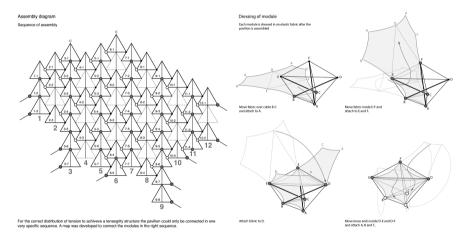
The two drawings necessary to assemble the Underwood Pavilion
